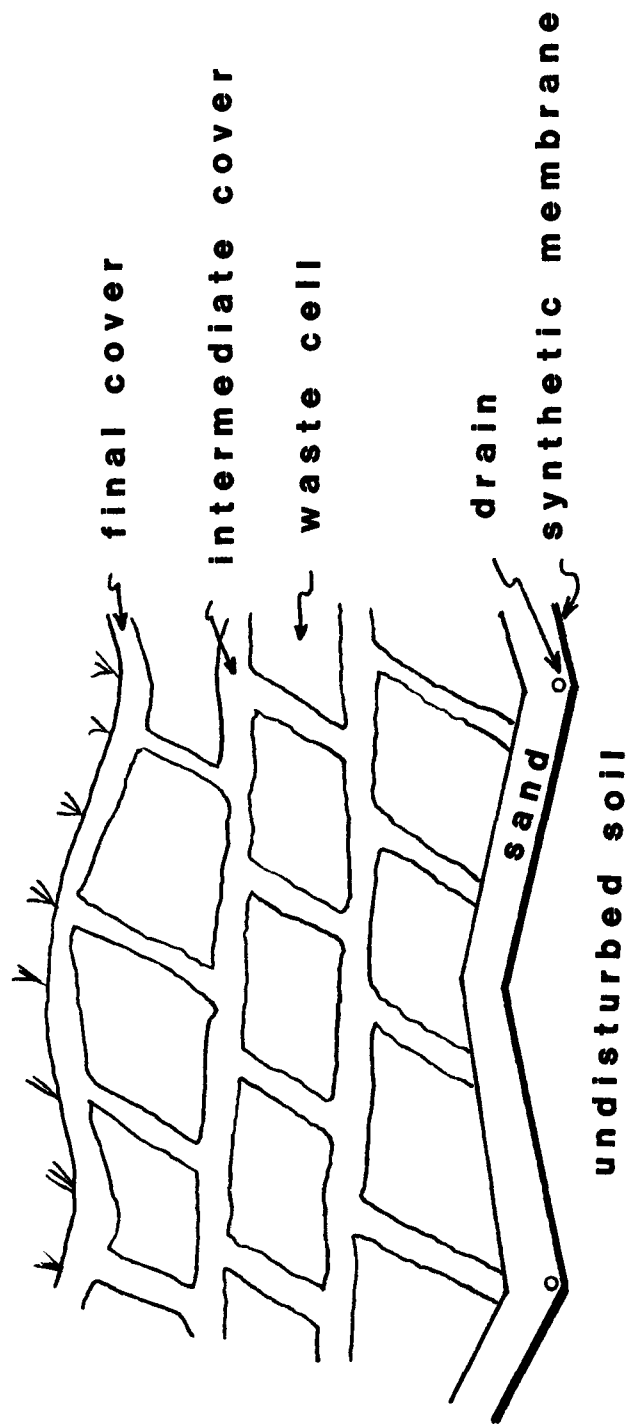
Cross-section of landfill delineating typical containment modules.
